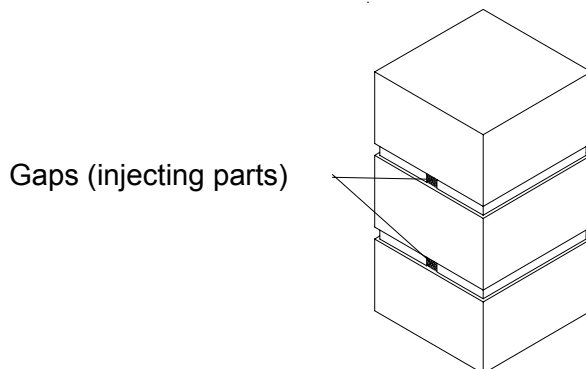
A Specimen of Masonry Assemblage with Defective Joint
